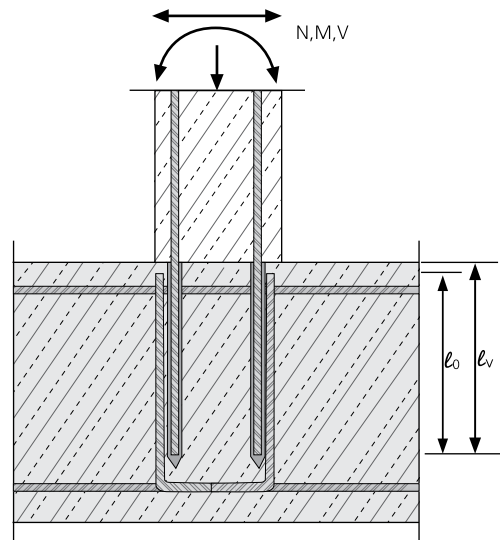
Overlap joint at a foundation of a column or wall where the rebars are stressed in tension
